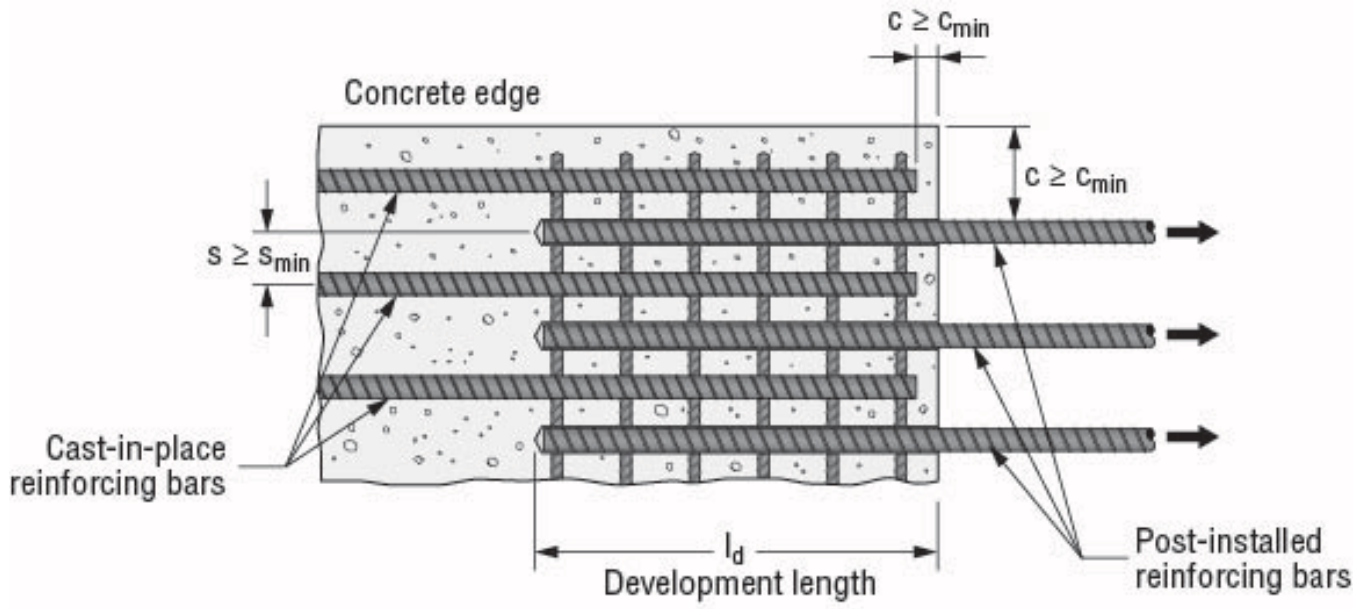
INSTALLATION PARAMETERS FOR POST-INSTALLED REINFORCING BARS
